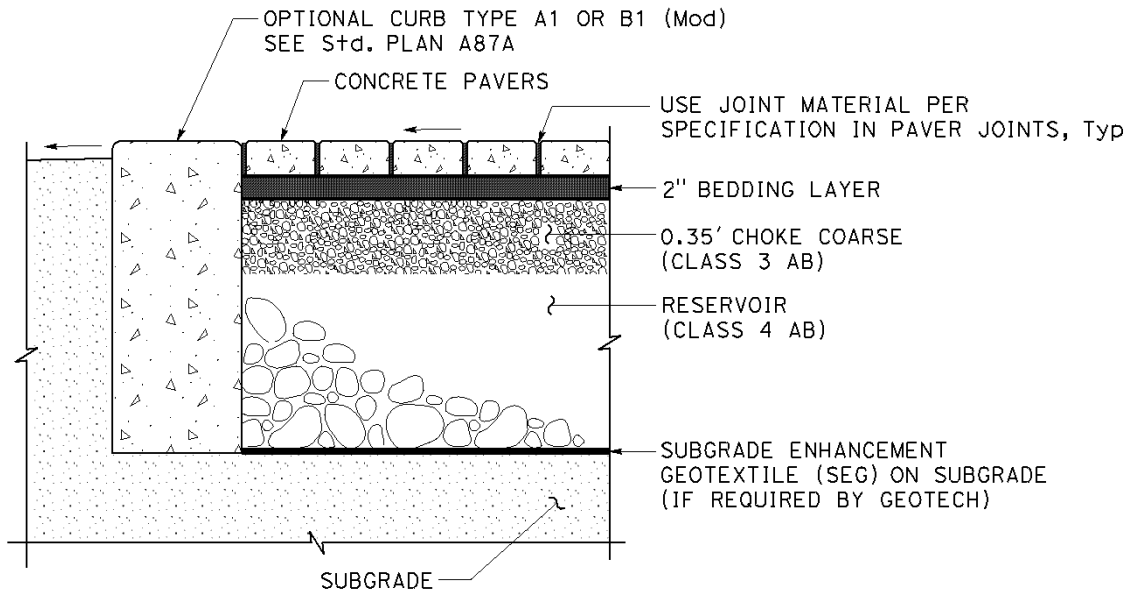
Permeable Interlocking Concrete Pavement (PICP) Typical Section
